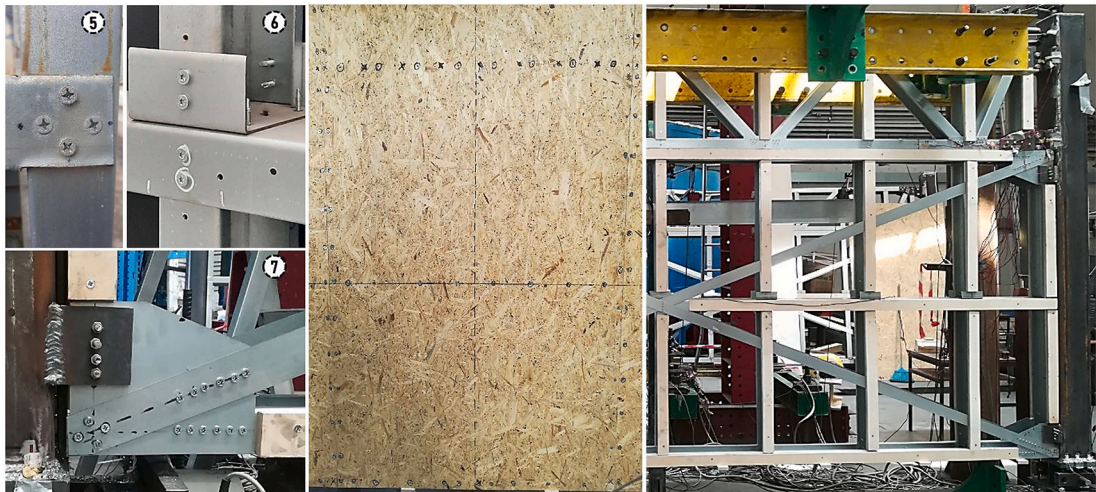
The LSF wall. The employed connections, OSB panel with screws positioning and pre-OSB installation layout with wood spacers.
